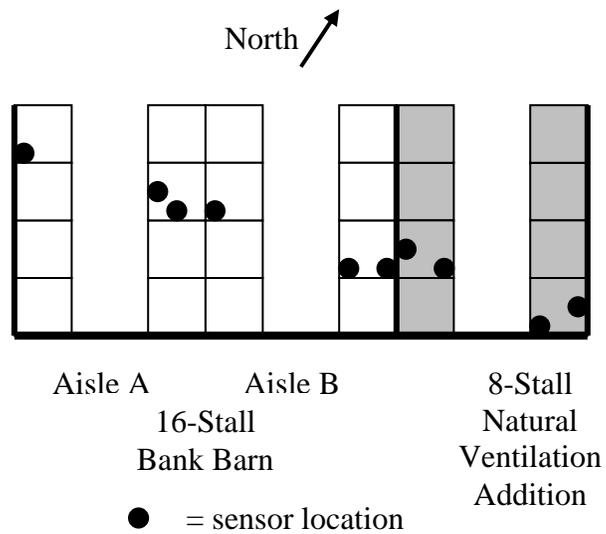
Plan view of 16-stall bank barn stable with naturally ventilated 8-stall addition. Indoor riding arena was a separate building about 100-meters northwest of the stable. The south stable wall is below grade.
